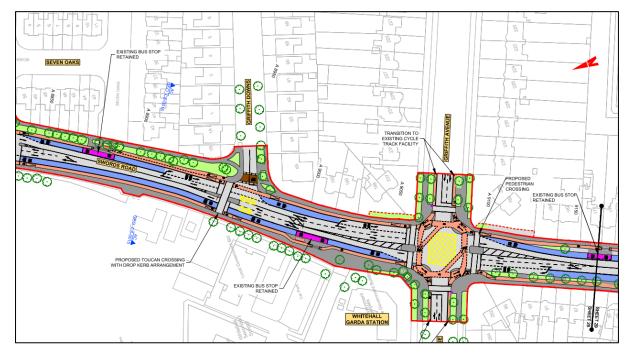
Extract from General Arrangement Drawing (Sheet 28)
